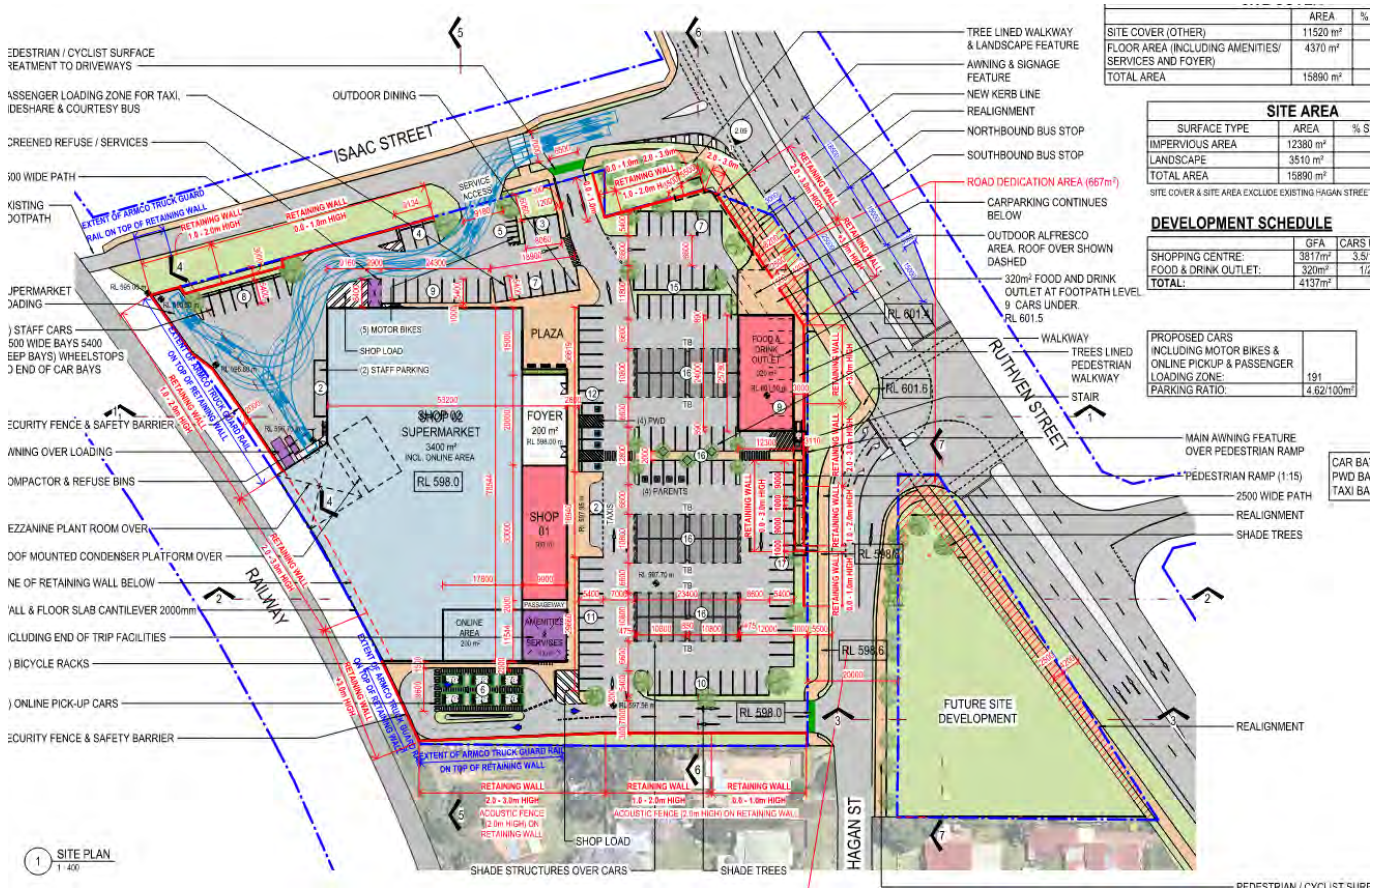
Proposed Development Layout (Source: A-1.02 Connectivity Plan (Rev 13) by Thomson Adsett)
